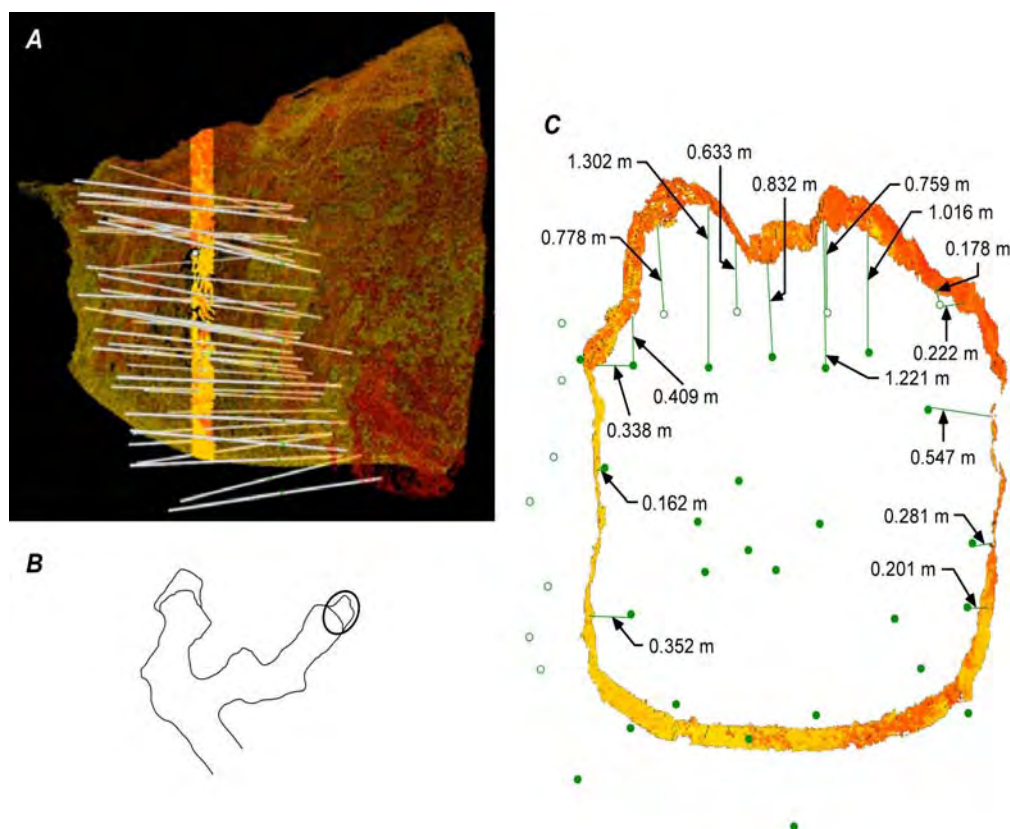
A. Vertical longitudinal section through XC 11 from before and after laser scans; showing projected drill pattern and position of the mid-round cross-section. B. Outline of the workings showing location of sections. C. Vertical slice at mid-round showing drill hole intercepts with distances to the ribs and back, solid points were loaded holes and open points were unloaded perimeter holes.
